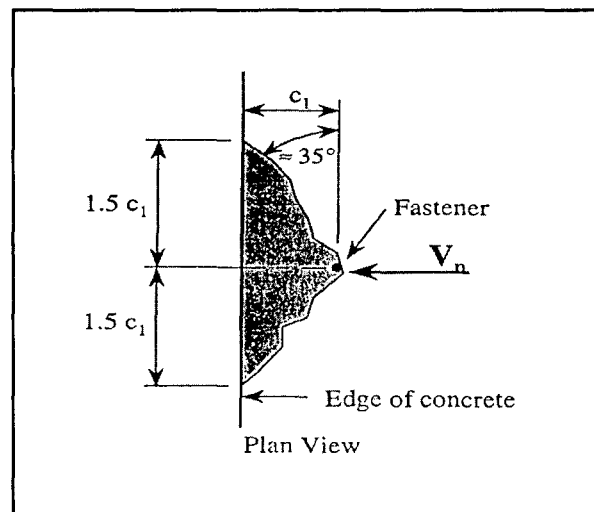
Breakout cone for shear.
